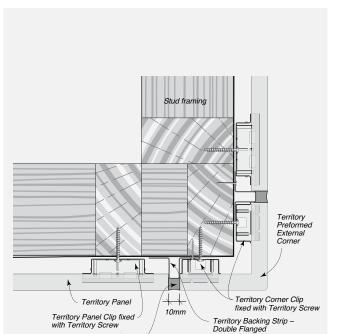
External Corner Detail - with Aluminium External Corner
